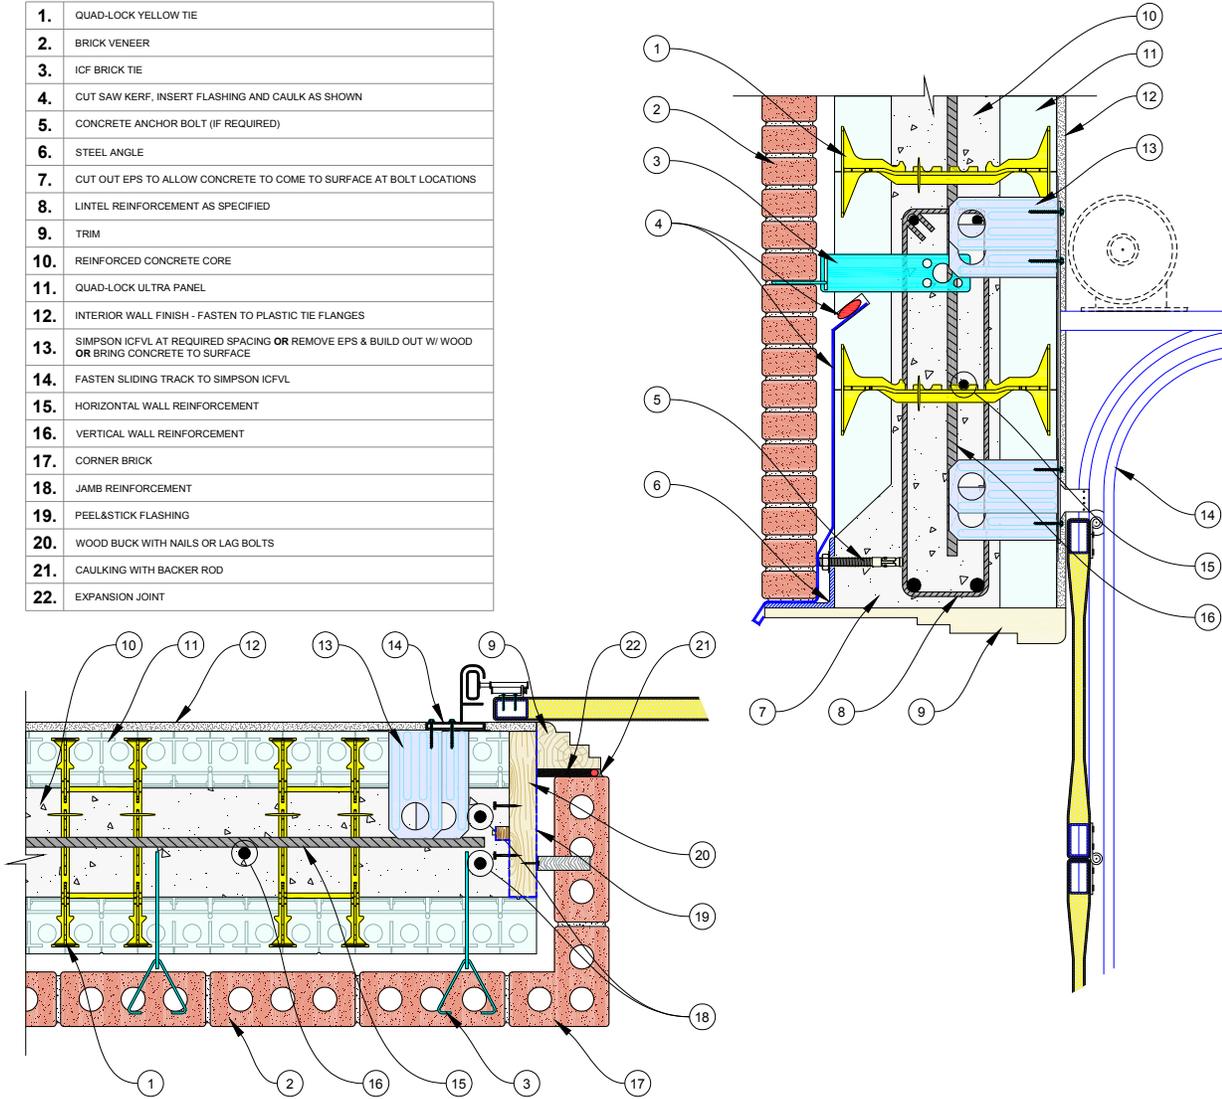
Garage Door at Jamb and Head (Brick Finish)
